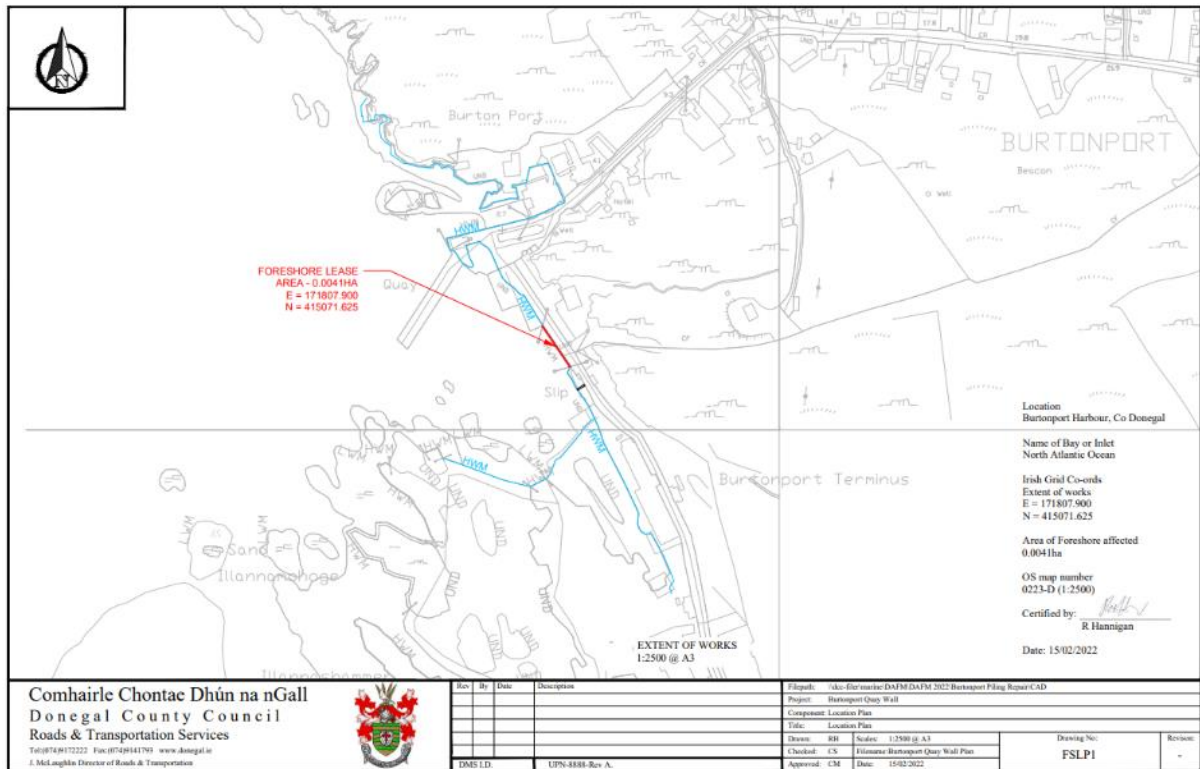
The proposed project site layout, project in red. Burtonport Quay Wall Location Plan (from applicant documents).
